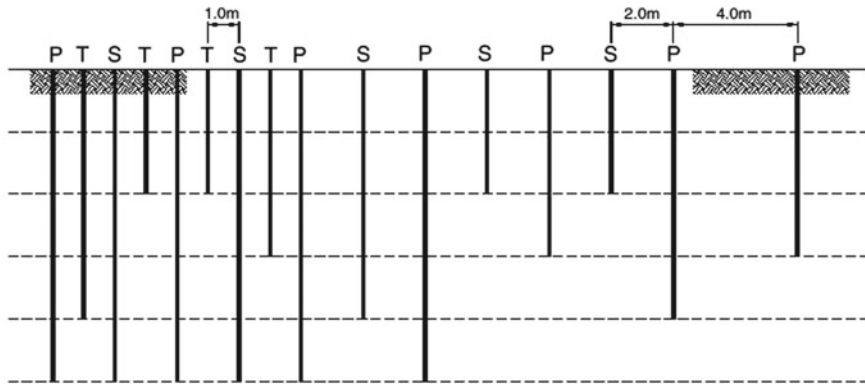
Closure method—primary, secondary, and tertiary grouting points
